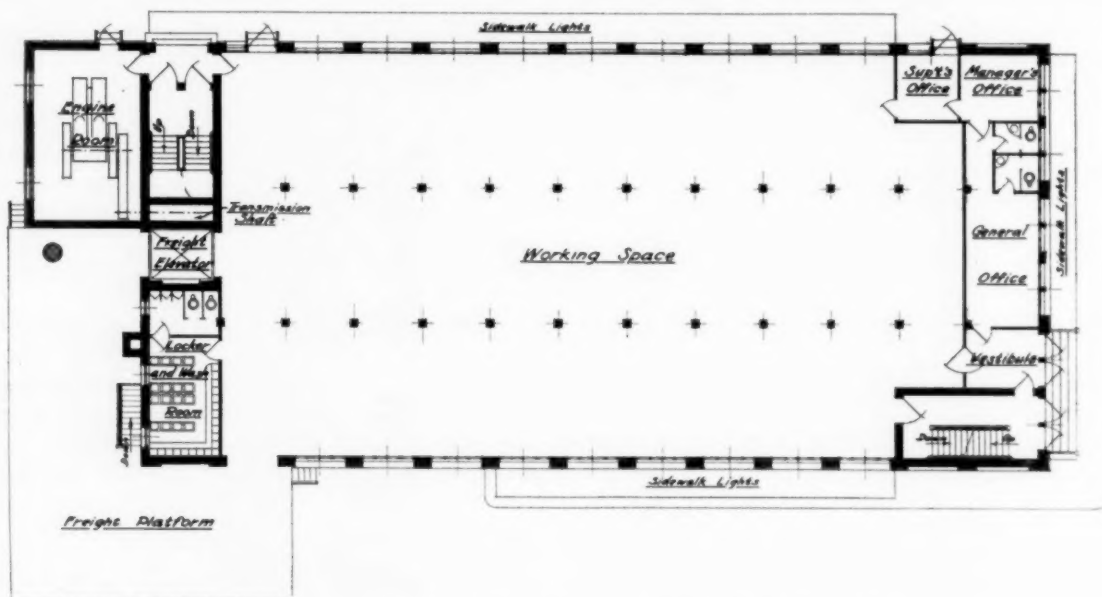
FACTORY BUILDING MILL CONSTRUCTION. FIRST FLOOR PLAN
